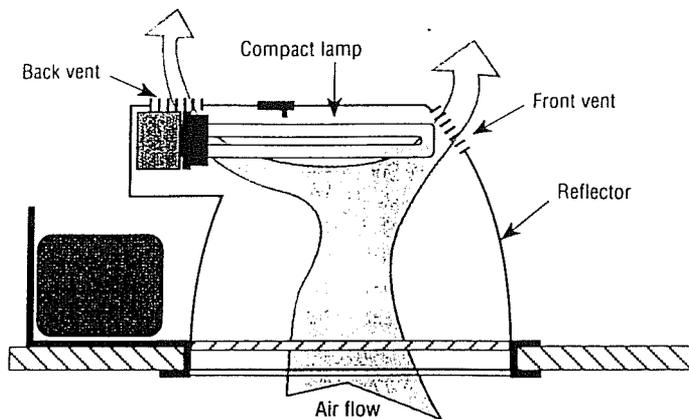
Cross section of a fixture with front and back venting geometry, illustrating the air flow through the fixture.
